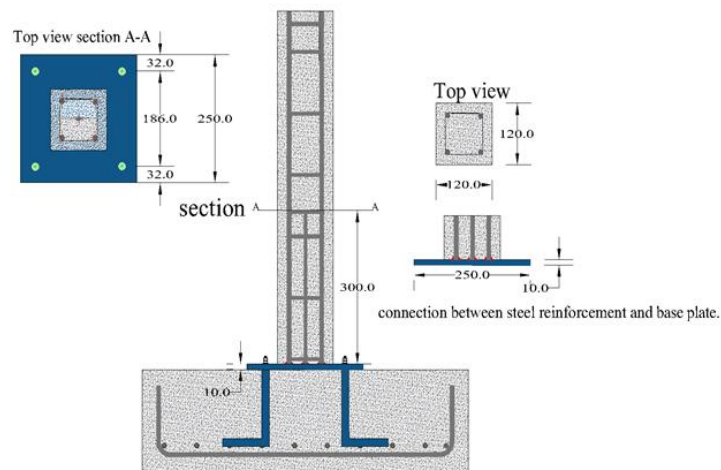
Details of steel reinforcement for the column- foundation bolted connection one face welded type
